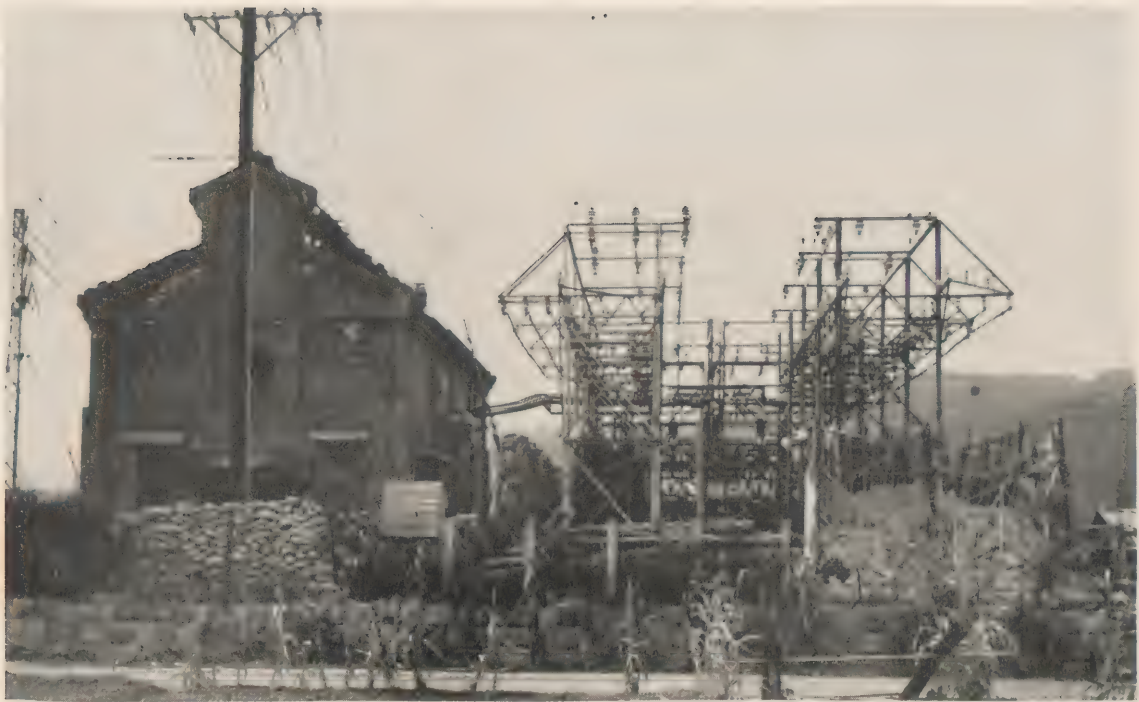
XIII. Undamaged busbars and transformers at Misasa substation, 5,500 feet from GZ.
